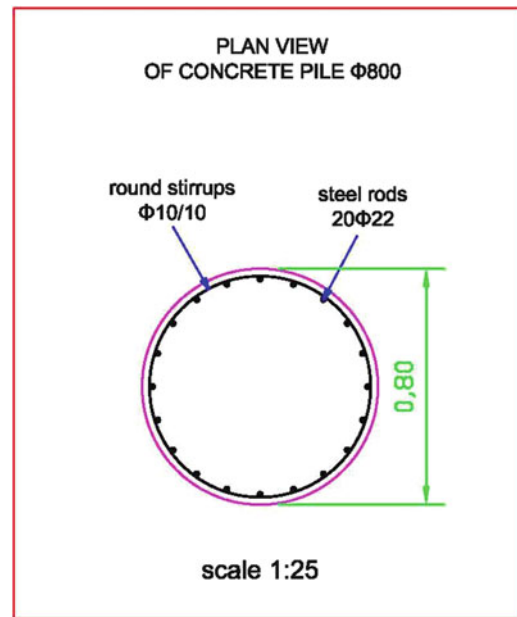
Plan view of concrete pile $\Phi 800$, with 20 $\Phi 22$ steel rods and round stirrups $\Phi 10/10$
